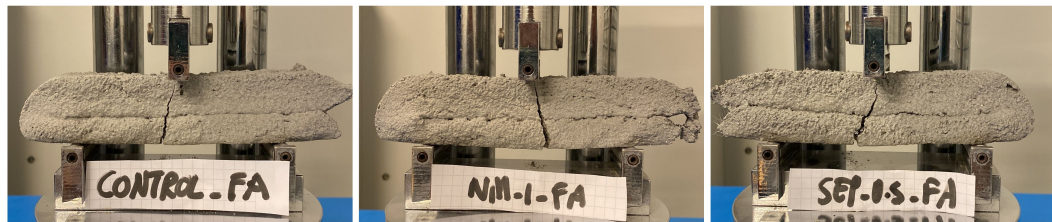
Fracture failure of the printed beams after conducting three-point bending test.
